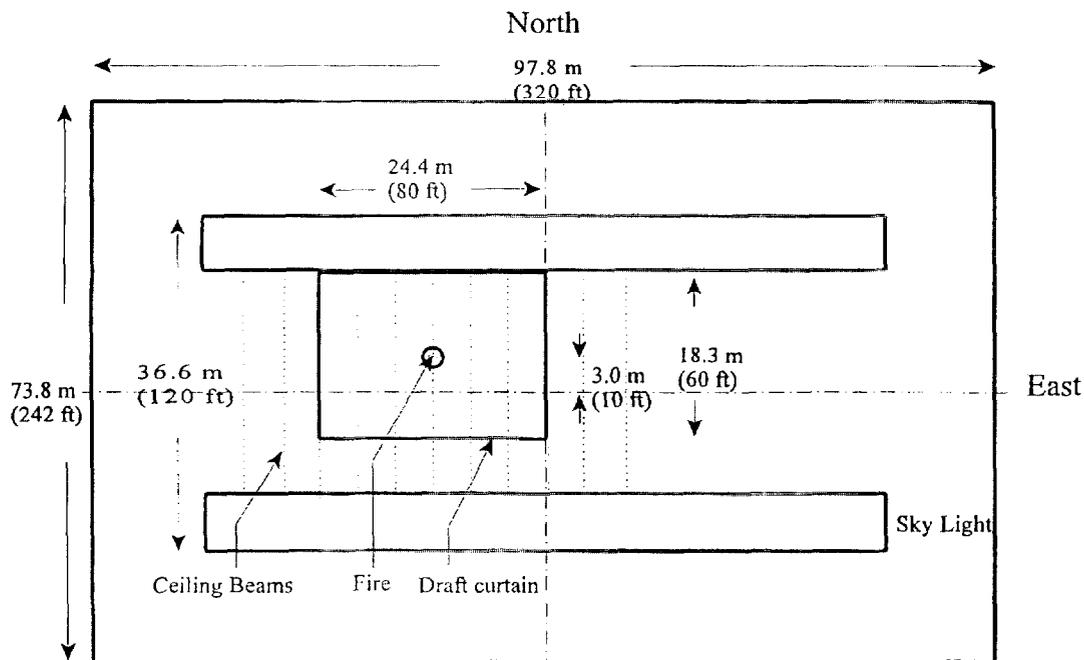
Plan view of 15 m (50 ft) hangar bay.
